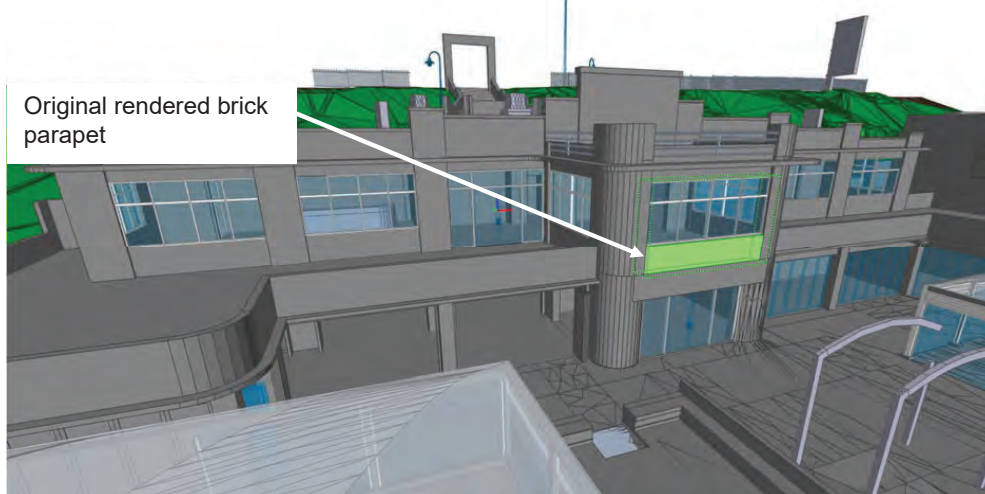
of brick parapet highlighted green, although it does extend to the curved section of the front wall either side.
